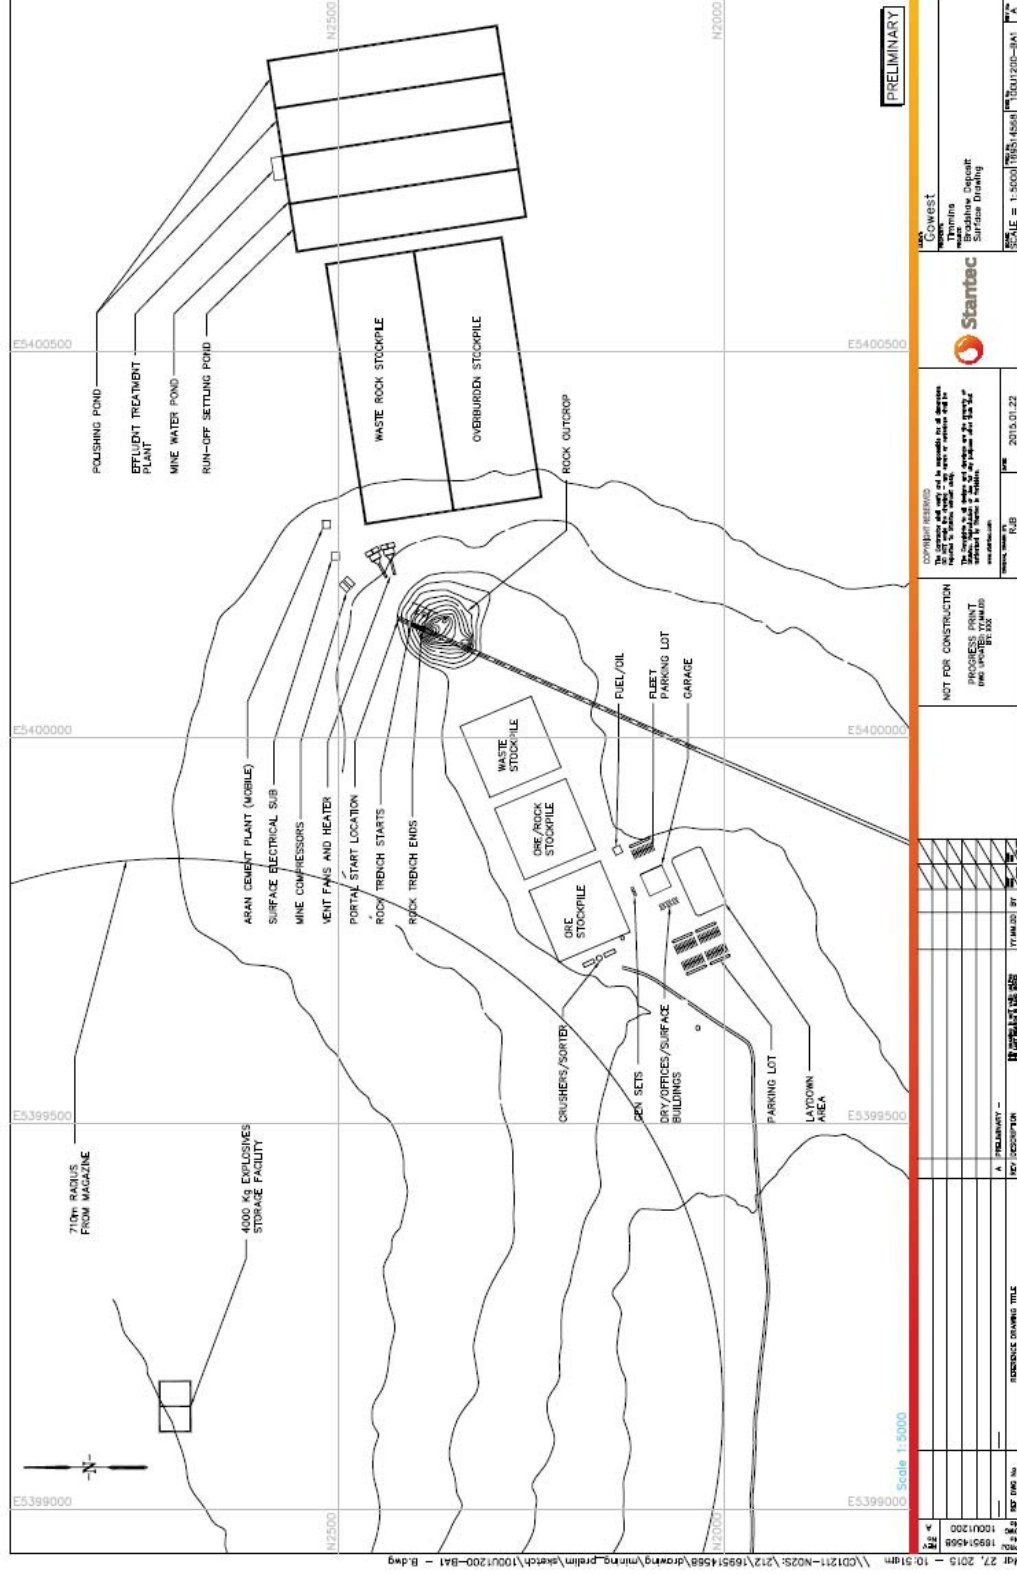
Proposed Surface Mine Infrastructure Site Plan
